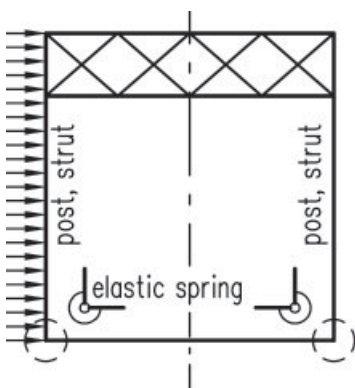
Springs at the intersections between cross-beams and main truss bottom chords
